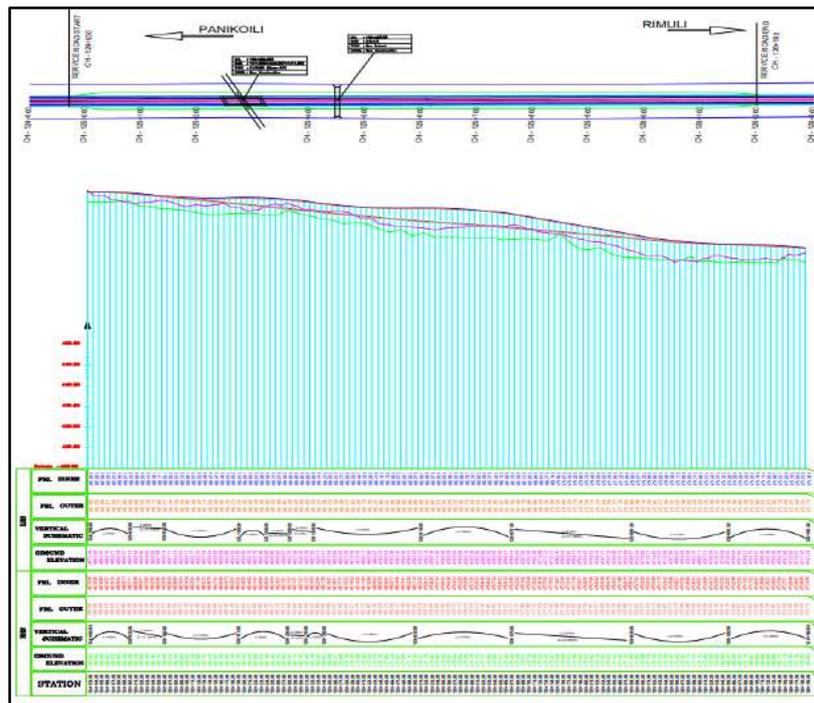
Plan and Profile of Slip Road from CH: 6+150 KM to CH: 7+538 KM
